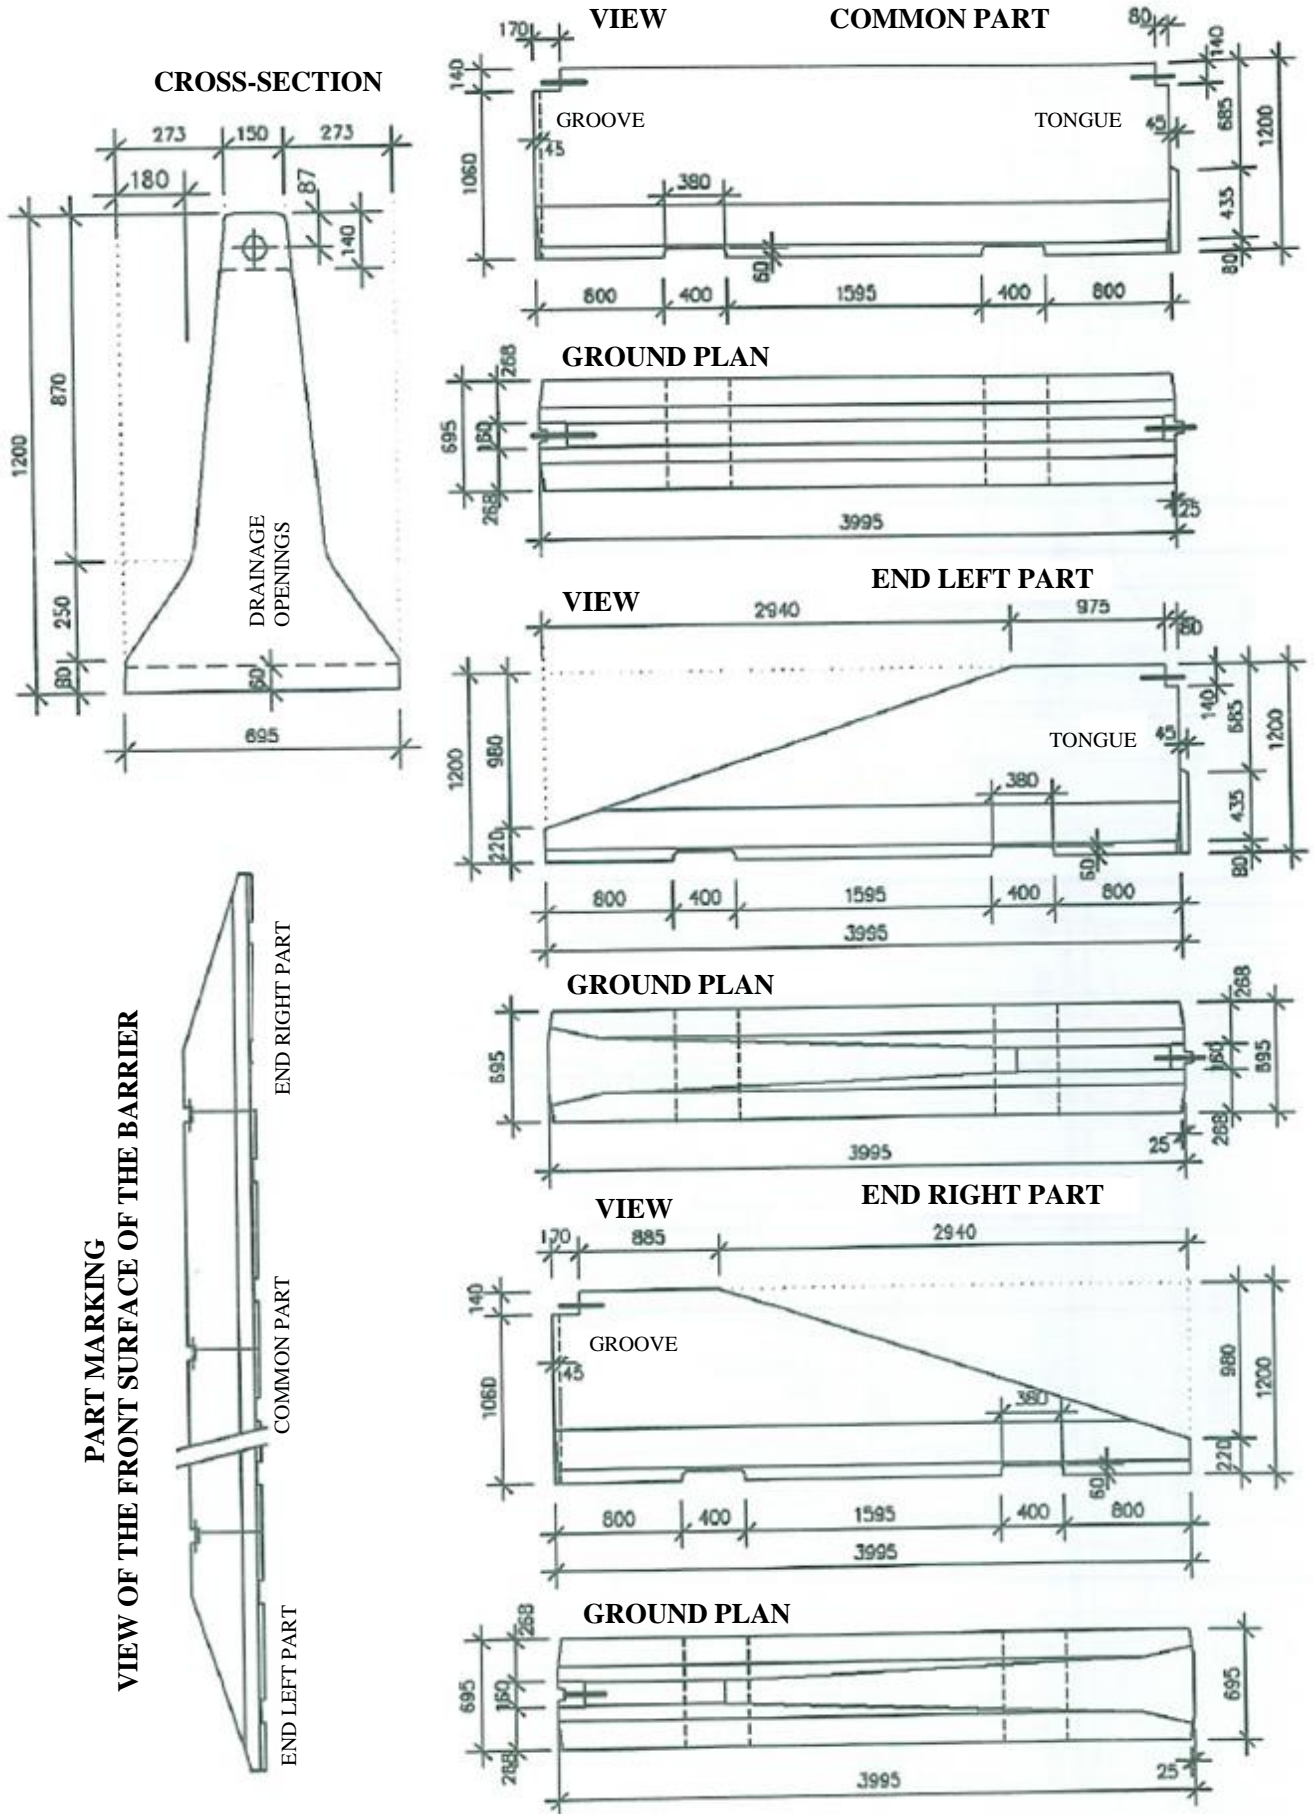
Double sided concrete barrier 1.2 m height – common and end part
